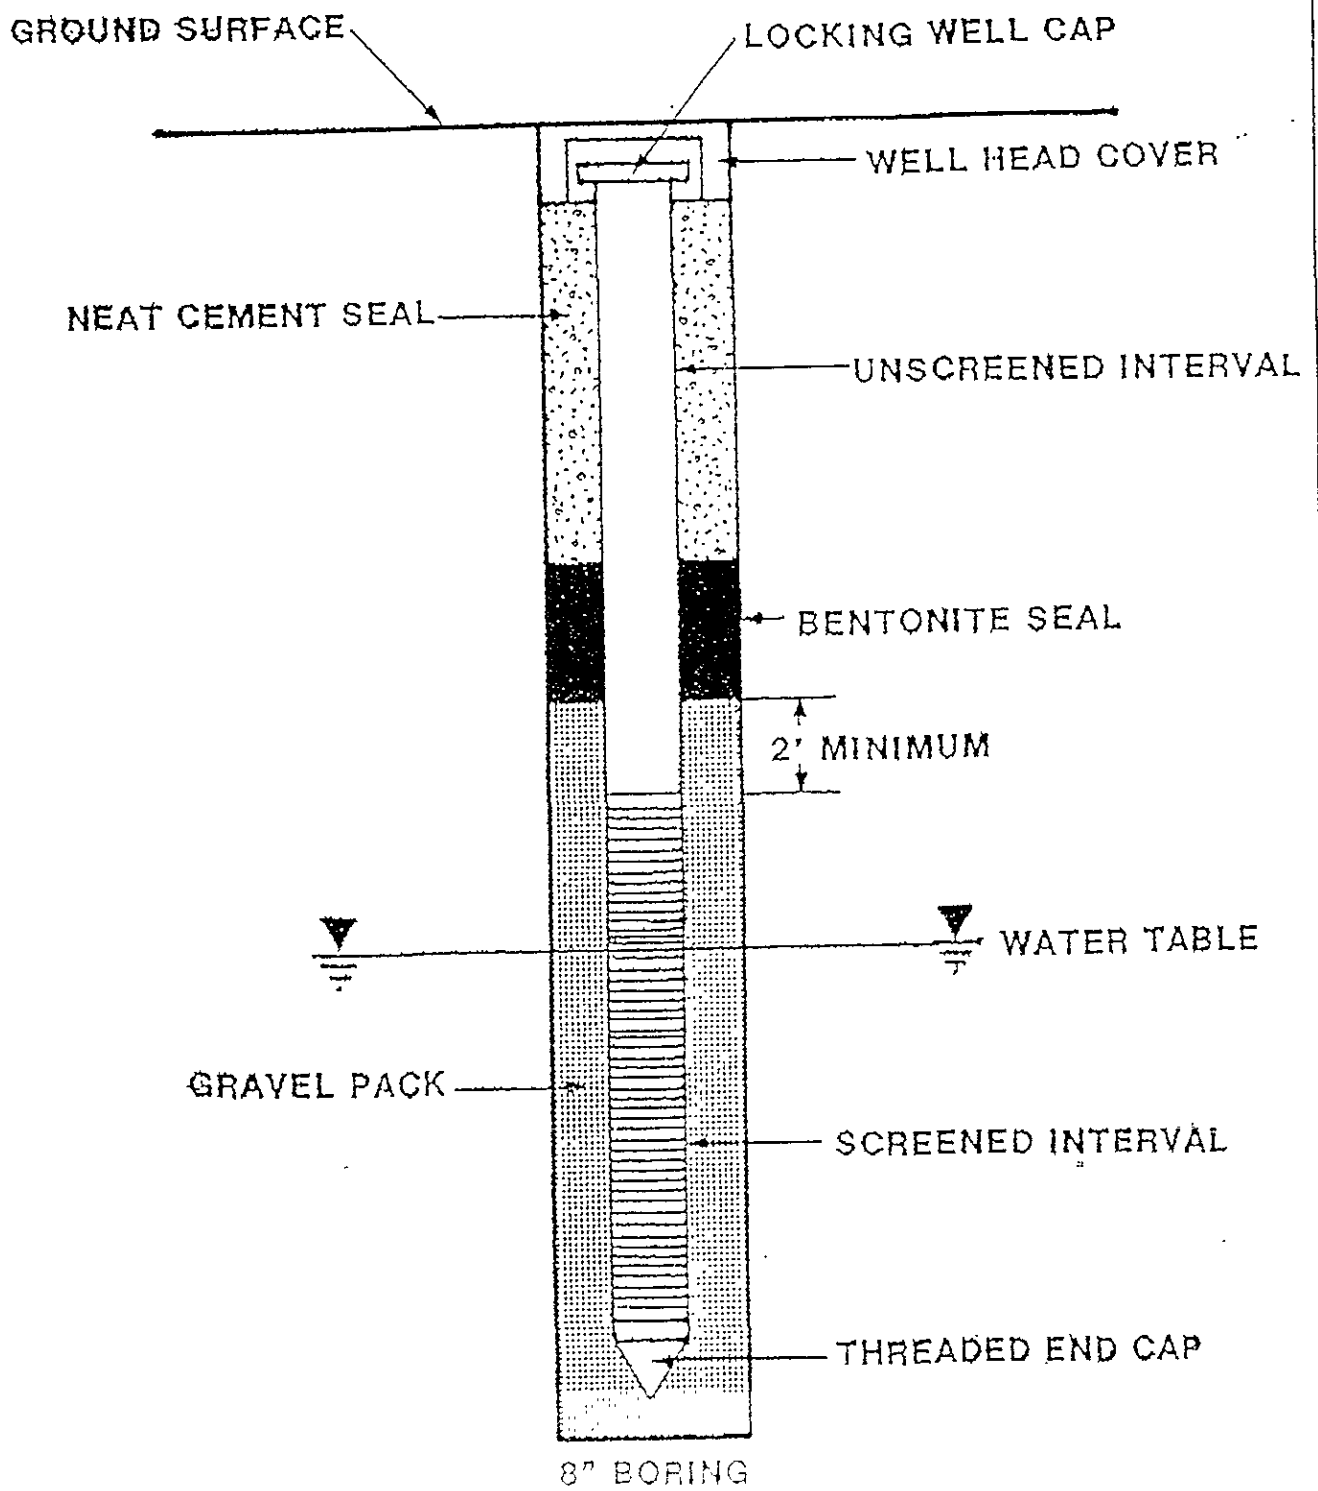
TYPICAL MONITORING WELL CONSTRUCTION DESIGN
